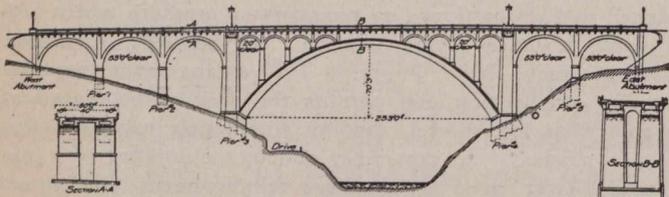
Walnut Lane Bridge, Philadelphia.
